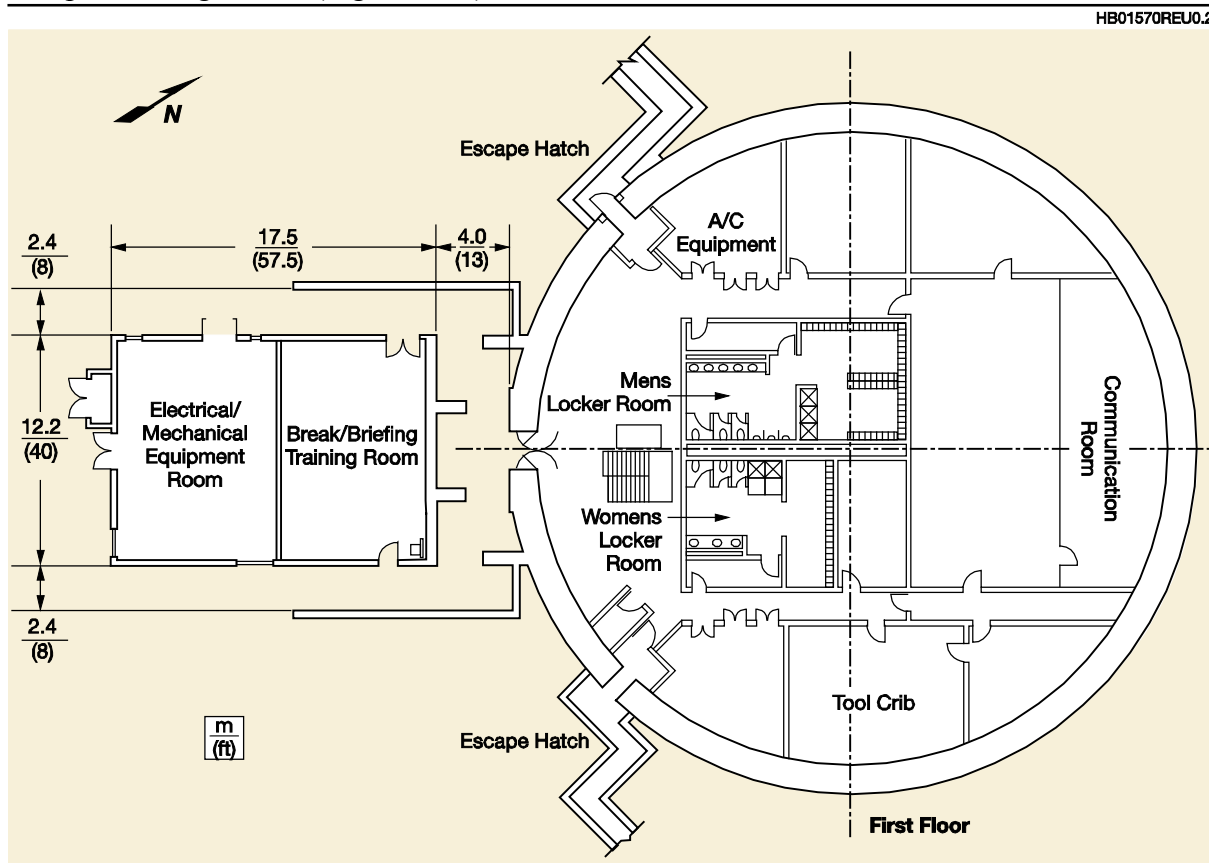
Space Launch Complex 37 Common Support Building (CSB) Sample Layout
